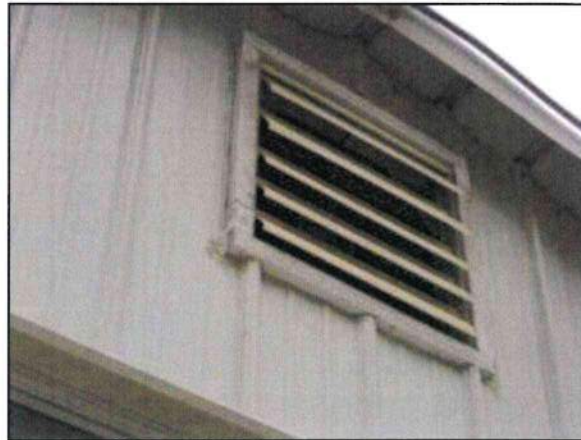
Fire Station #4 The vent of the steel addition is poorly constructed and the wood frame needs painting.
